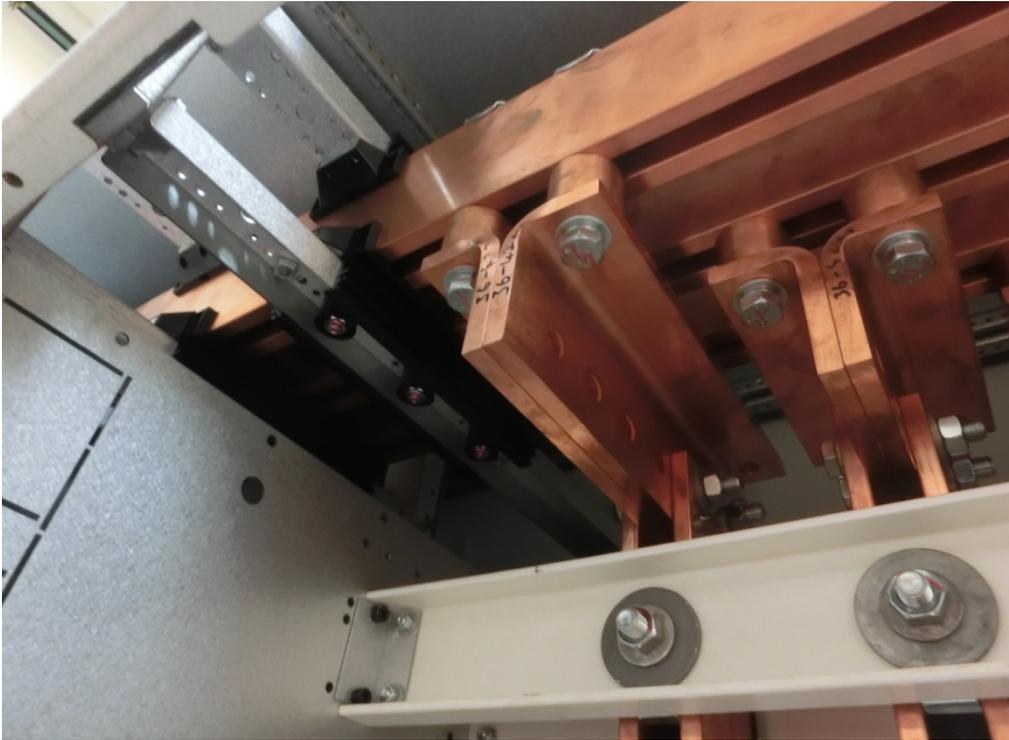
Visual Inspection: Large copper bars and mounting OK.
